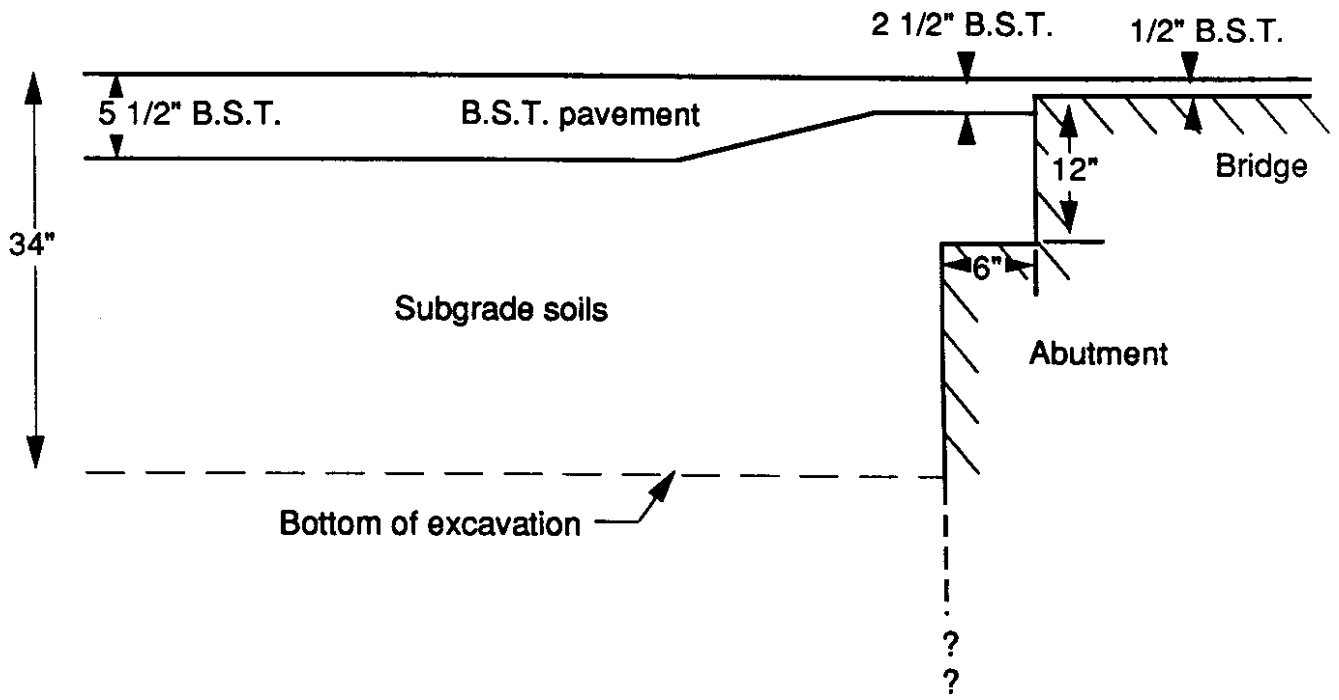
Approach Cross Section at Excavated Test Section, San Poil River Bridge (M.P.106)
